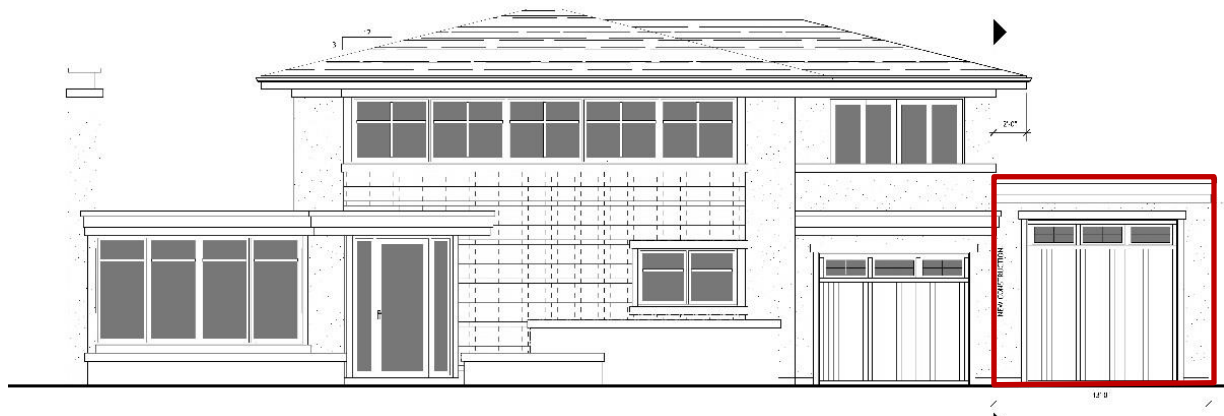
Elevation of existing dwelling with proposed garage addition outlined in red.
